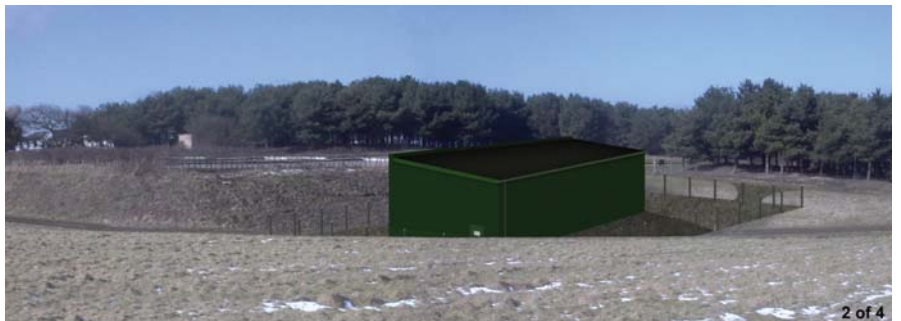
Photomontage of proposed Switch Room prior to new landscaping at The Muckleburgh Collection, Weybourne, Norfolk.
